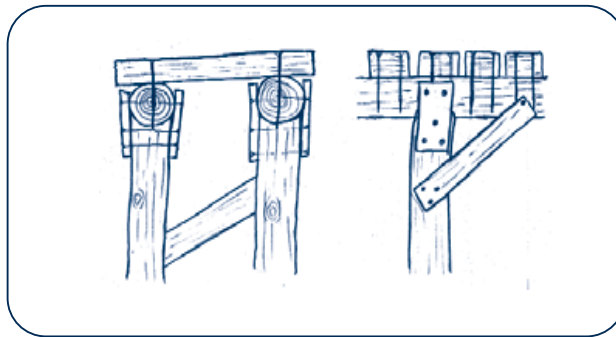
BRIDGE STRINGER SUPPORT AND CROSS BRACING
